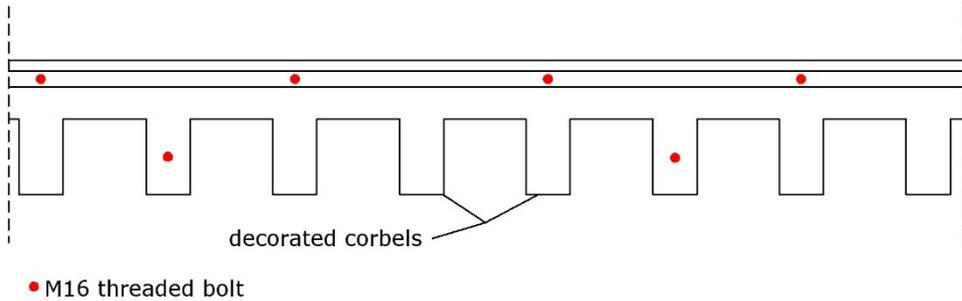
Scheme of cornice anchoring on each façade with mechanical fasteners.
